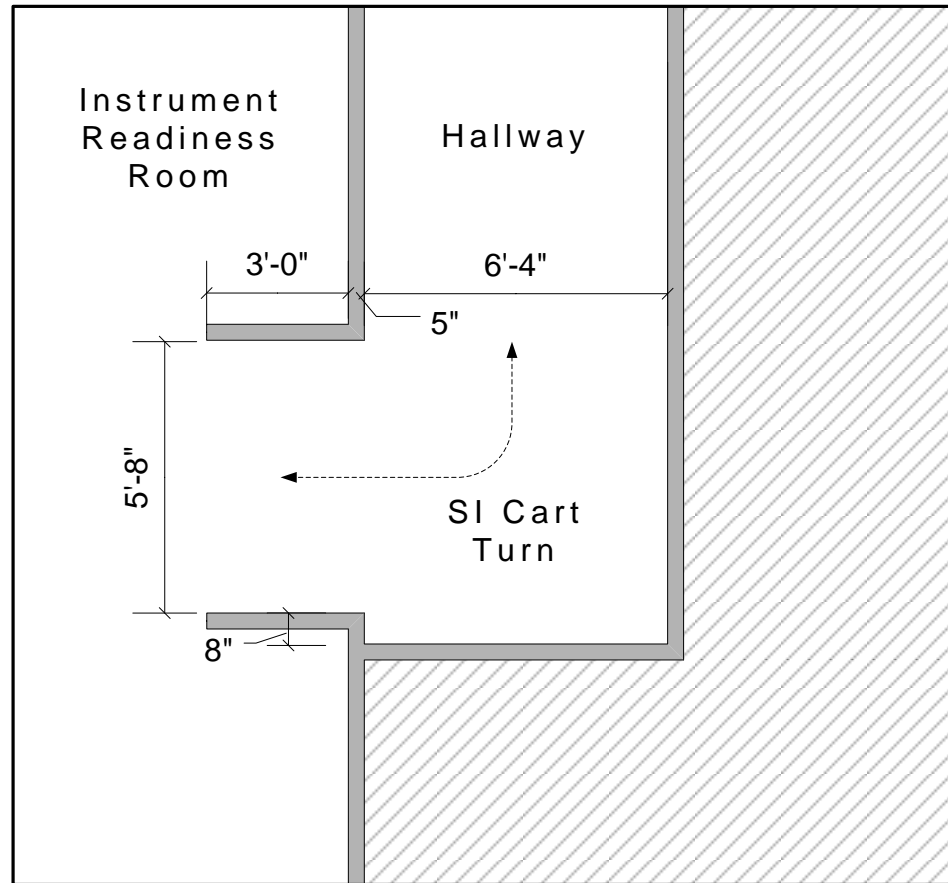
Dimensions and geometry of constrained SI Cart turn (Top view)
